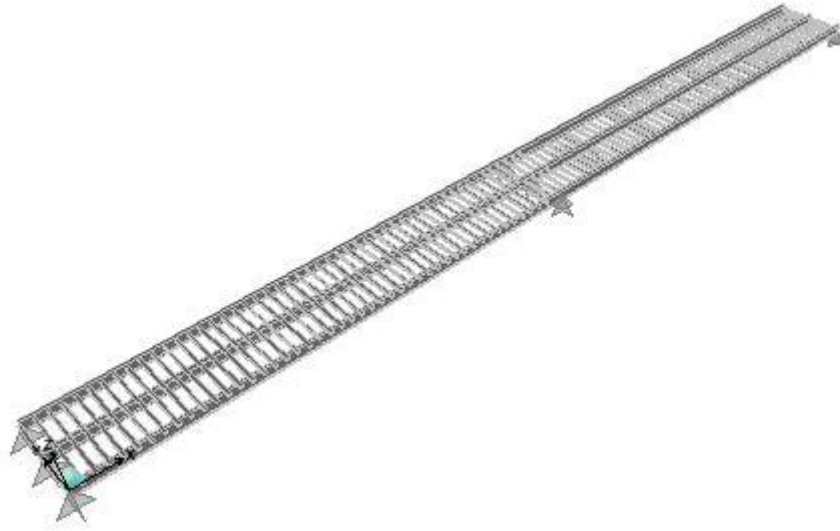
Footbridge near Radisson Water Garden Hotel (simplified model).
